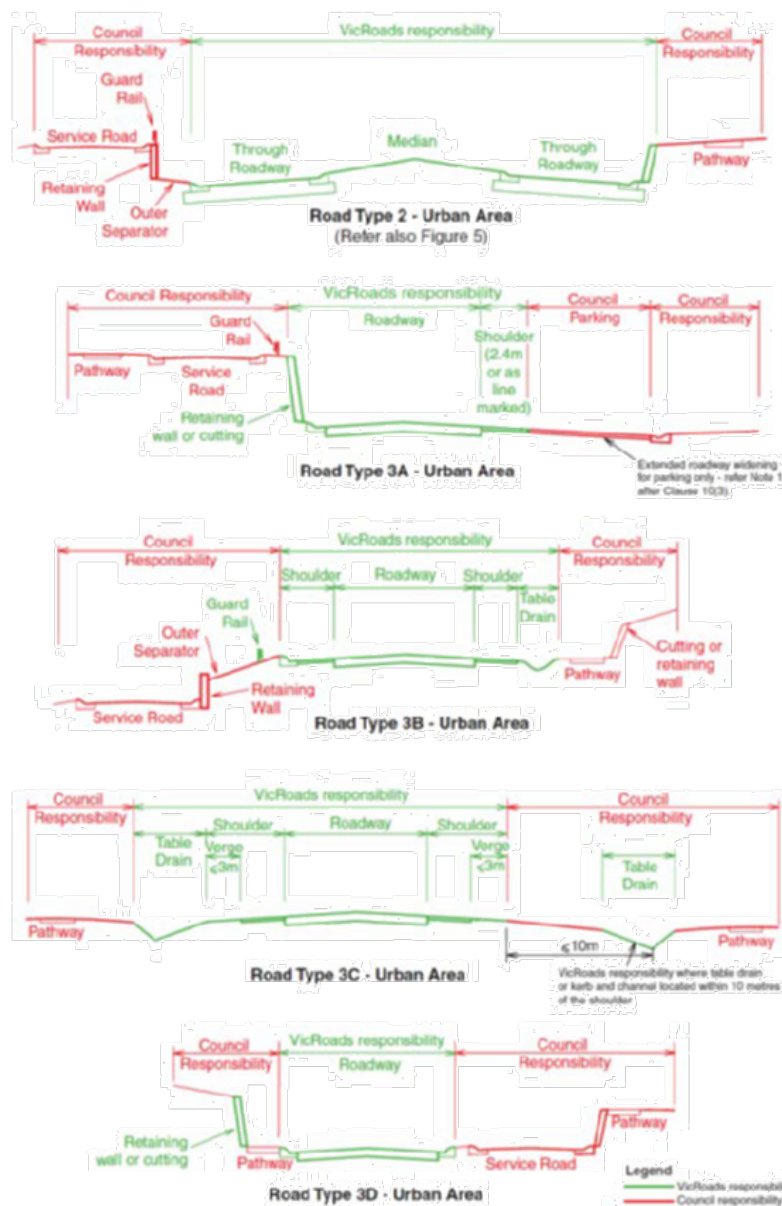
Demarcation Arrangements Urban Arterial Roads
